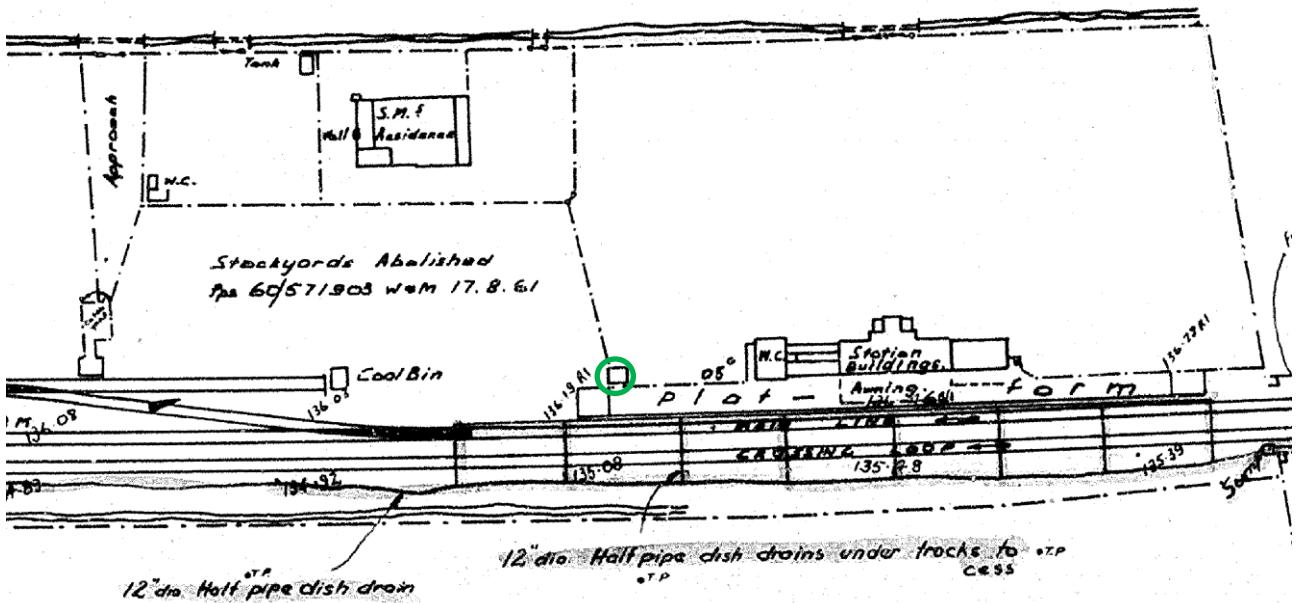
Excerpt from plan "NSWR Dapto Station Arrangements and Drainage", 1962. Source: Sydney Trains plan EDMS CV0444358
